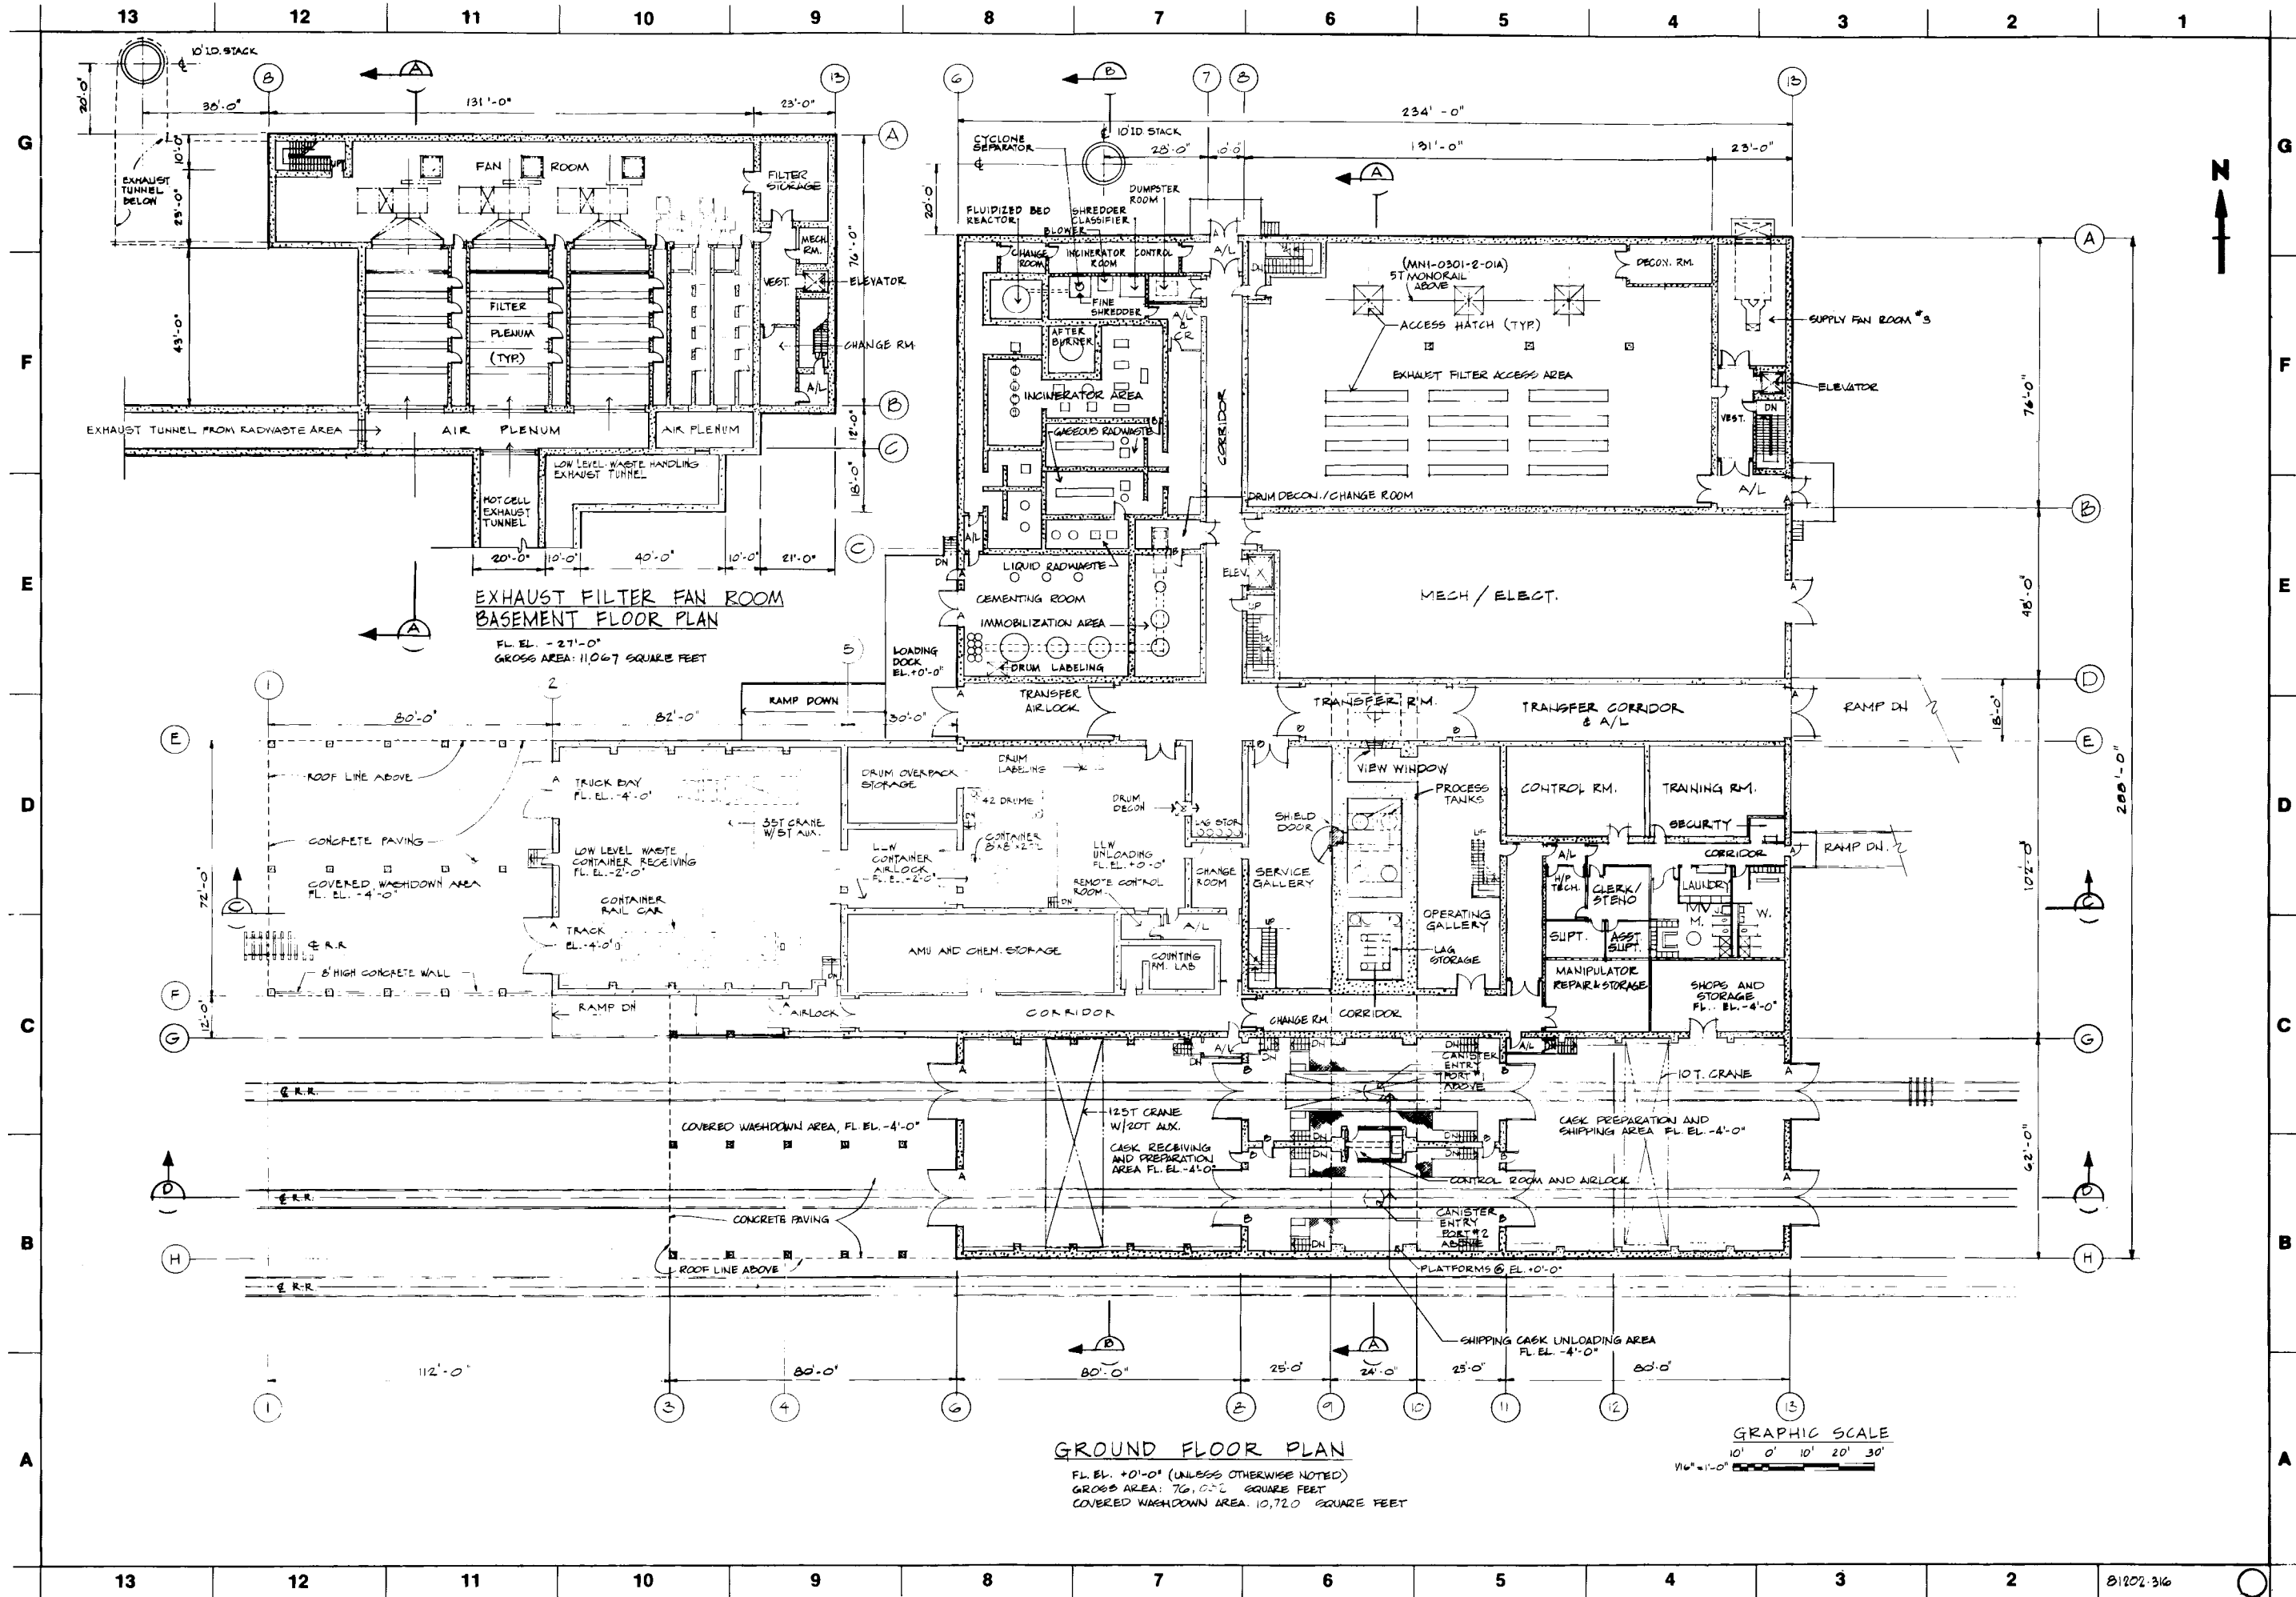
Waste Handling Facility - Ground Floor Plan
